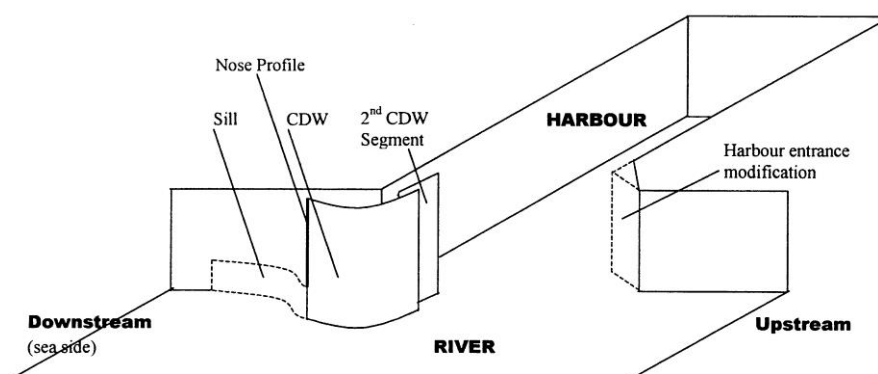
Current deflection wall (CDW) with bottom sill between wall and river bank (Van Leeuwen and Hofland, 1999)
